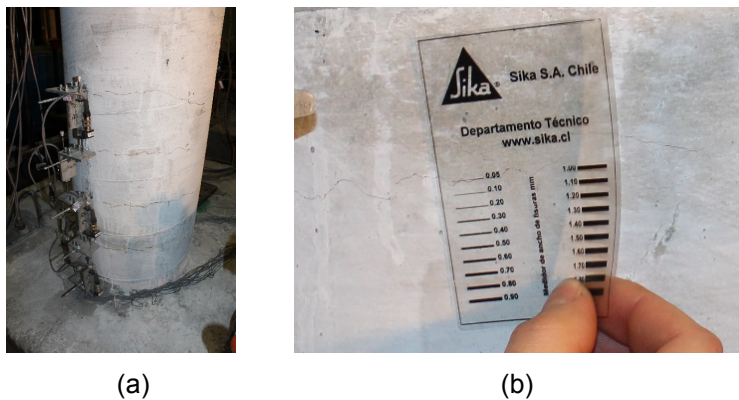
Damage in RC Bent Model 1. (a) Horizontal crack pattern. (b) Crack width.
